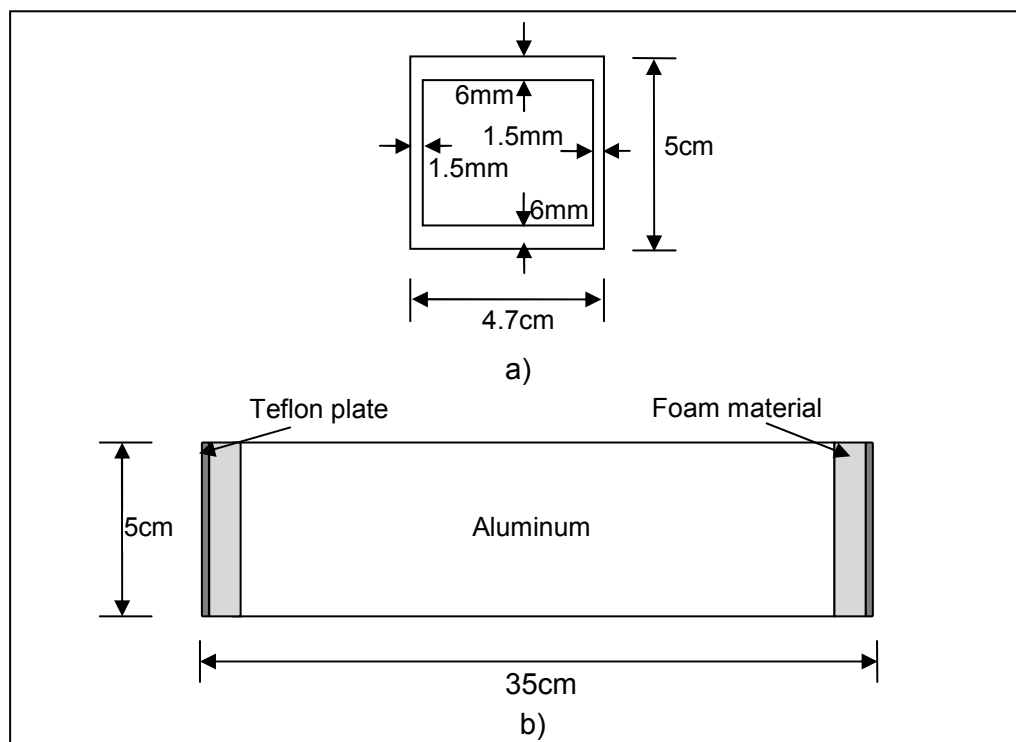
a) Cross section of the culvert model b) Longitudinal section of the culvert model
